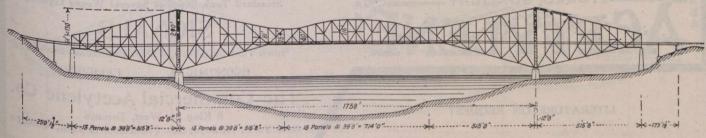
Unaccepted design M-N of St. Lawrence Bridge Co., for new bridge.
